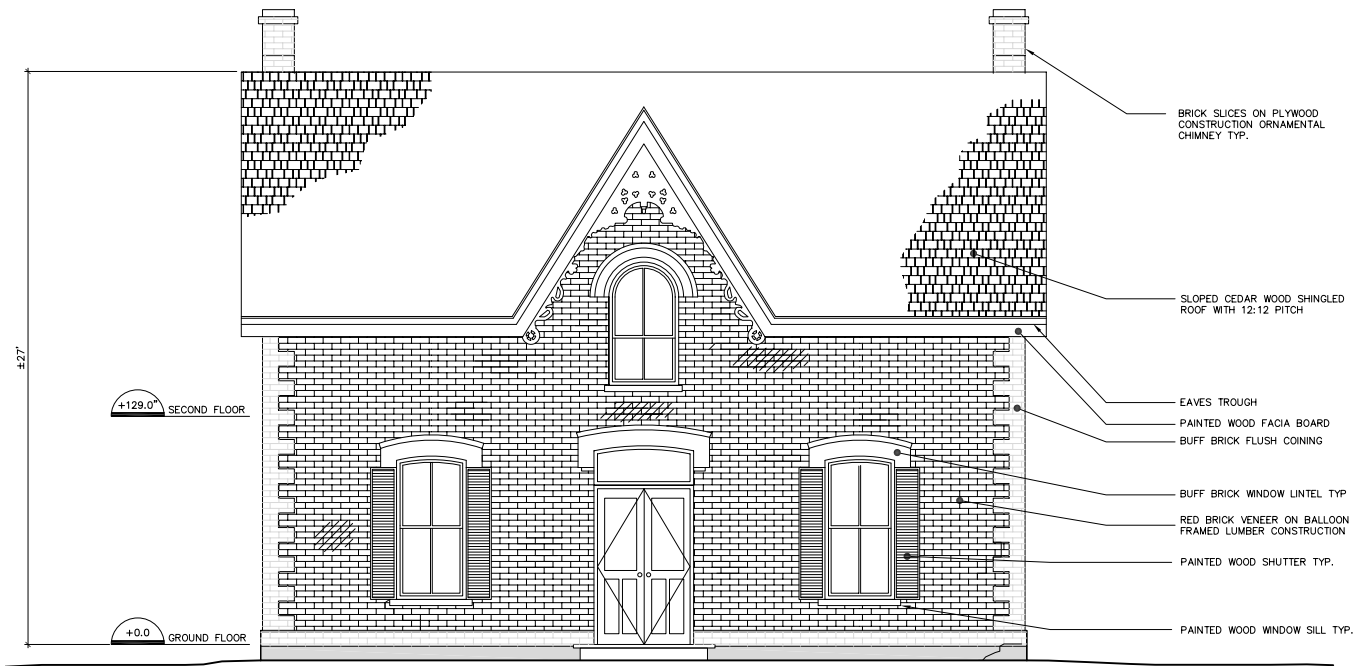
Britannia Farmhouse. East Elevation. 2009.
